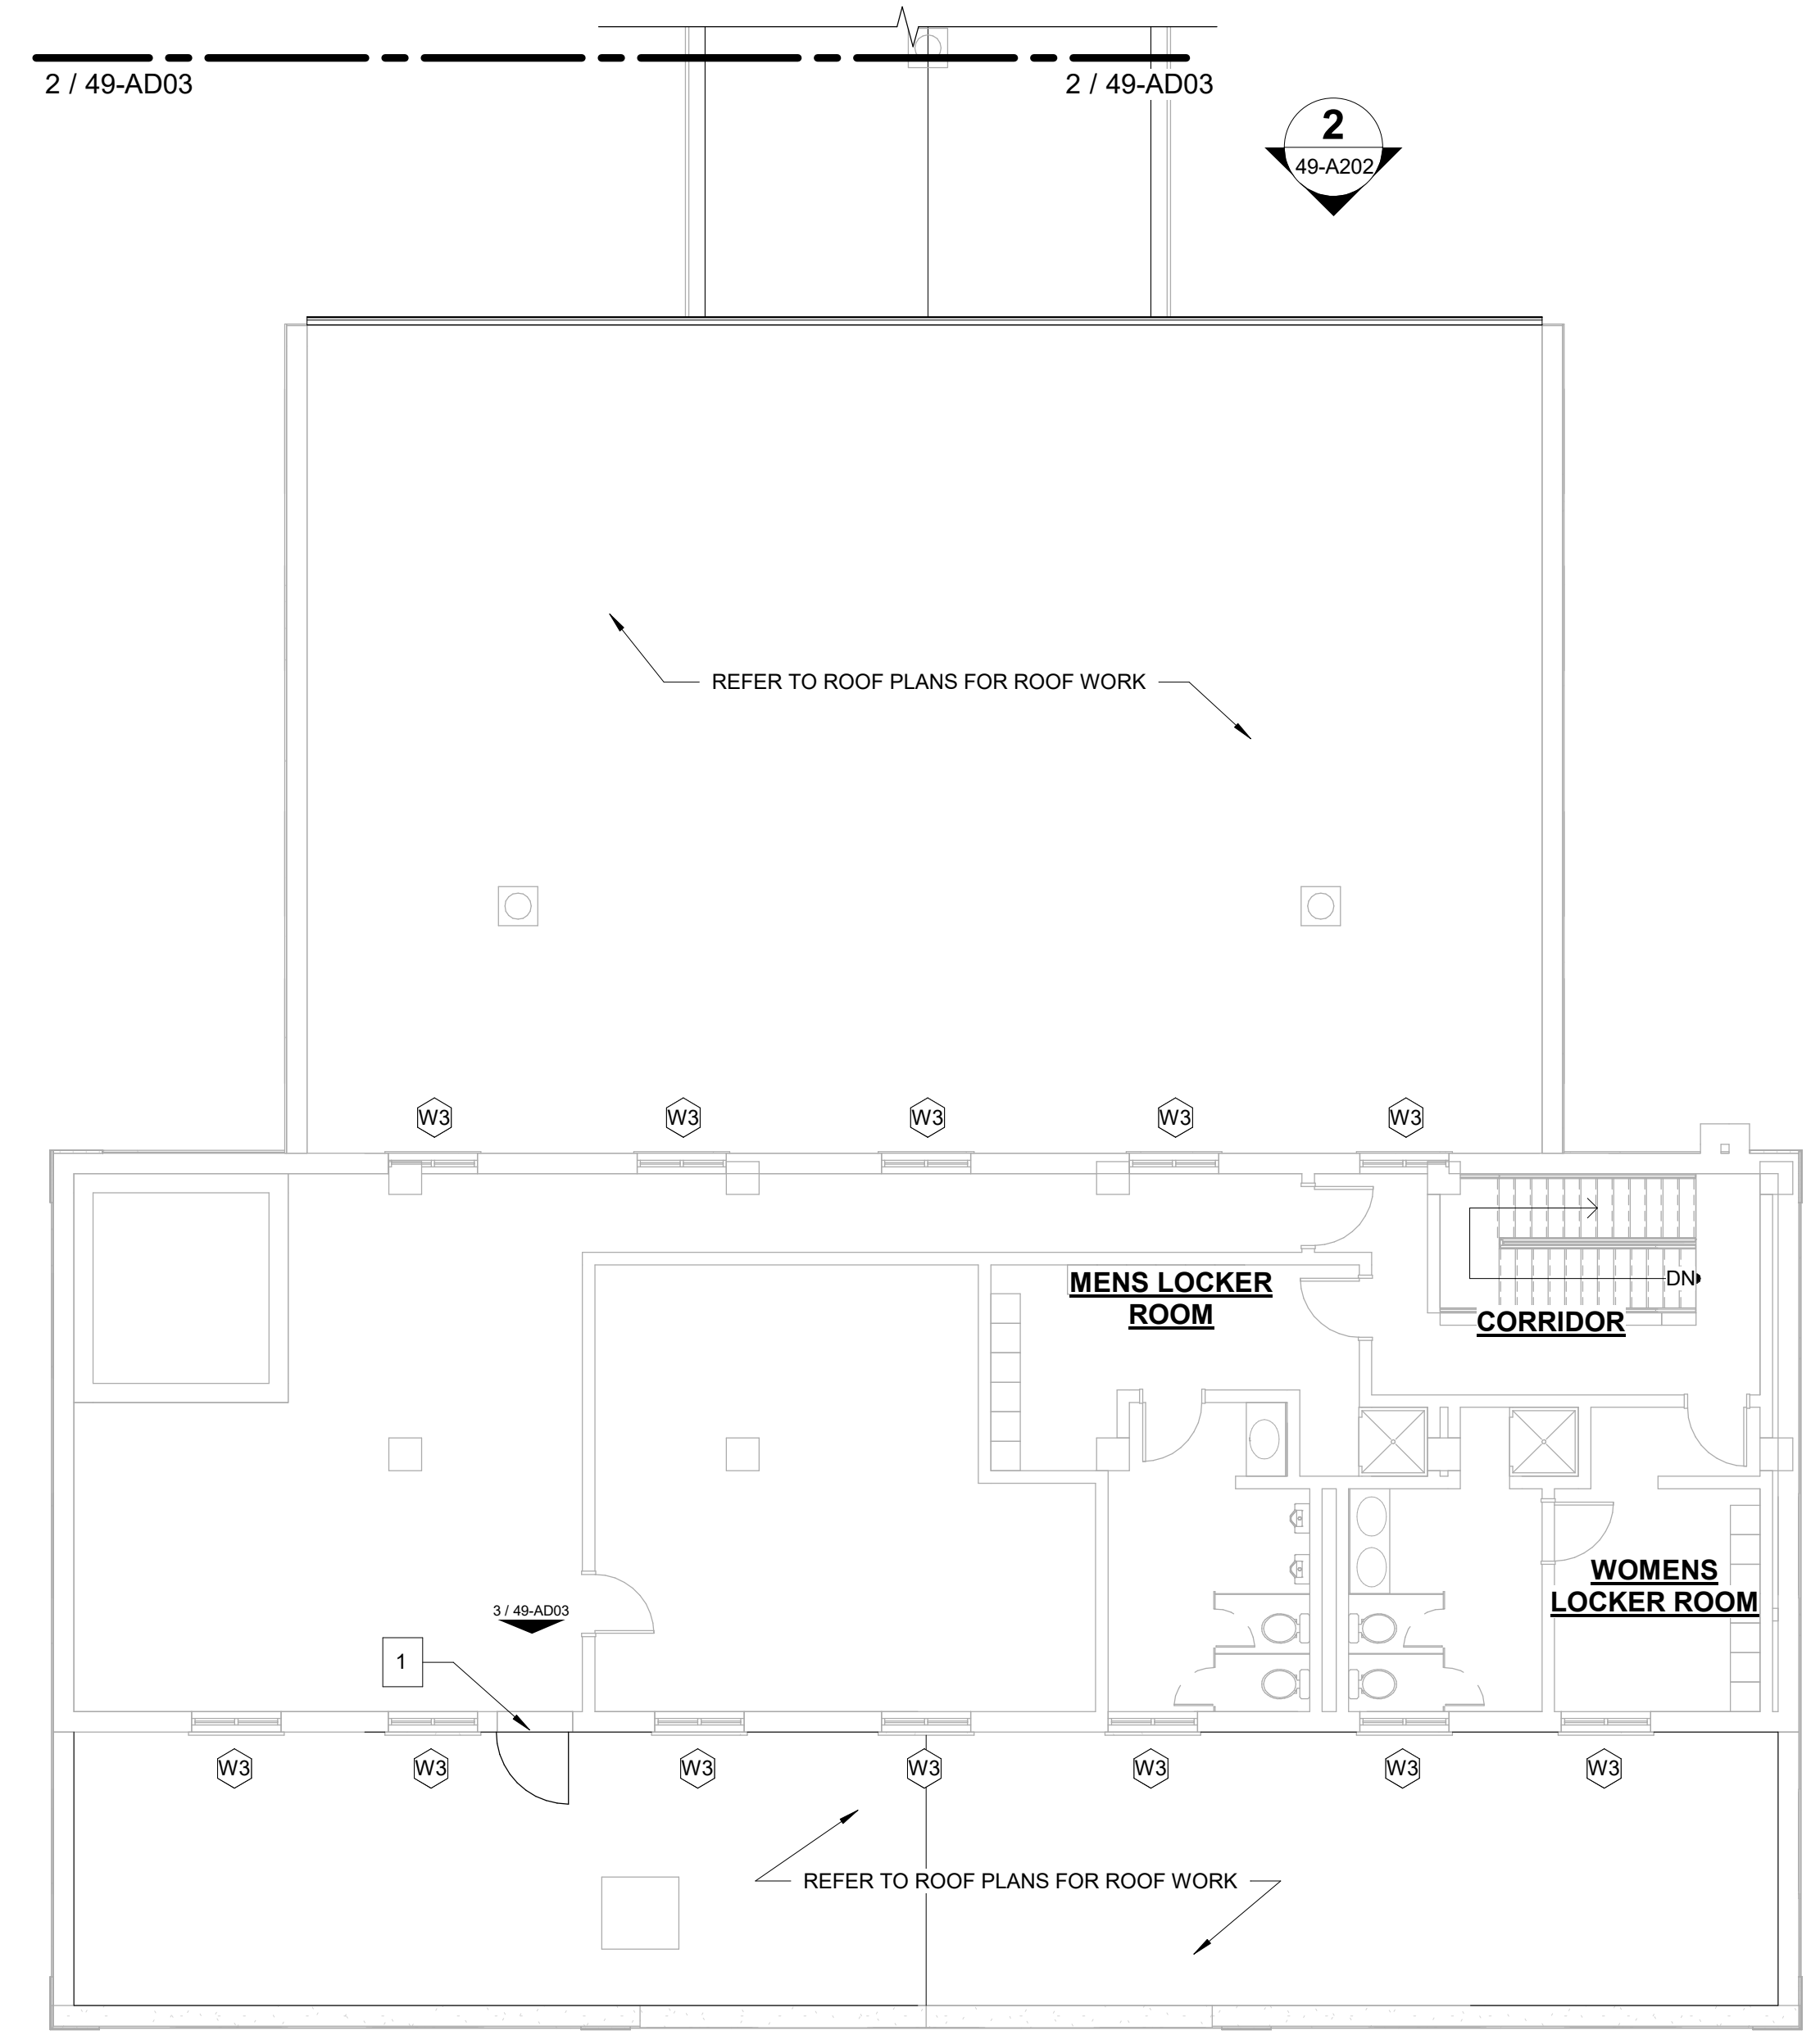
AD03 - FILTER BUILDING DEMOLITION AND NEW - THIRD FLOOR
